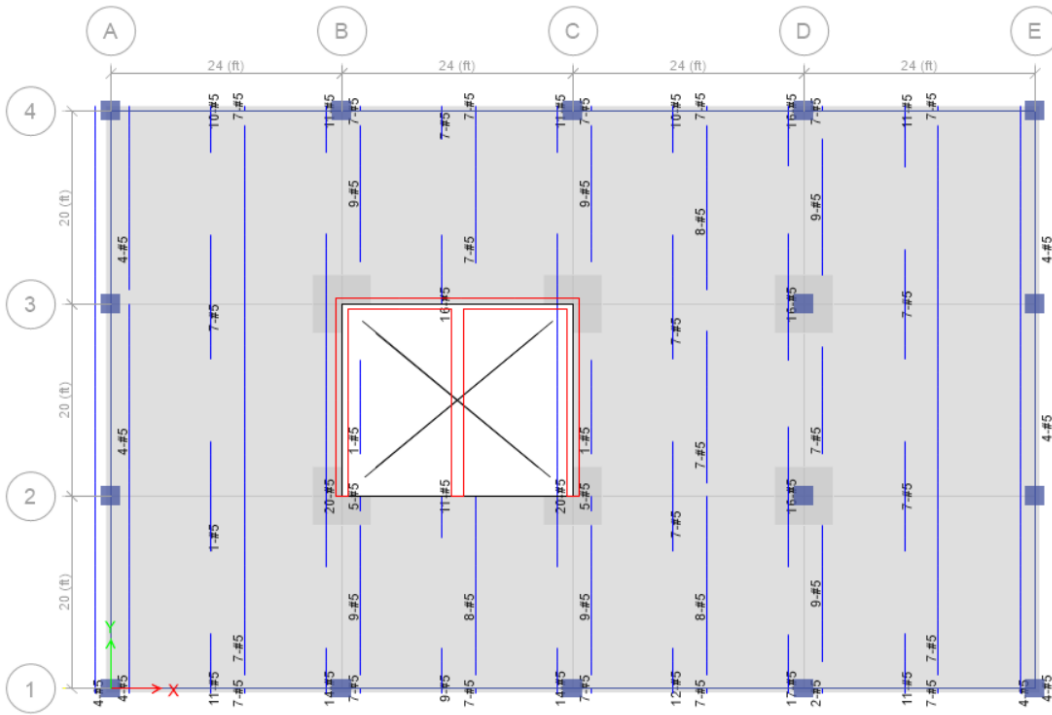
Reinforcement information for top and bottom rebar for layer B of slab
